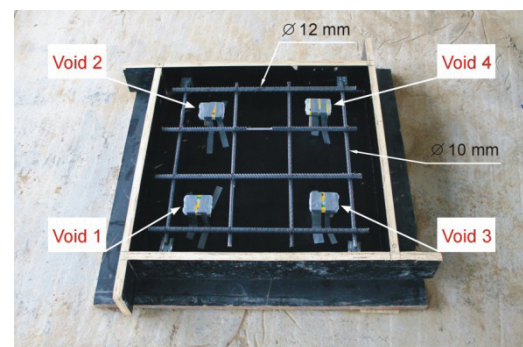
View of formwork, reinforcement mesh layout and defects before concreting
